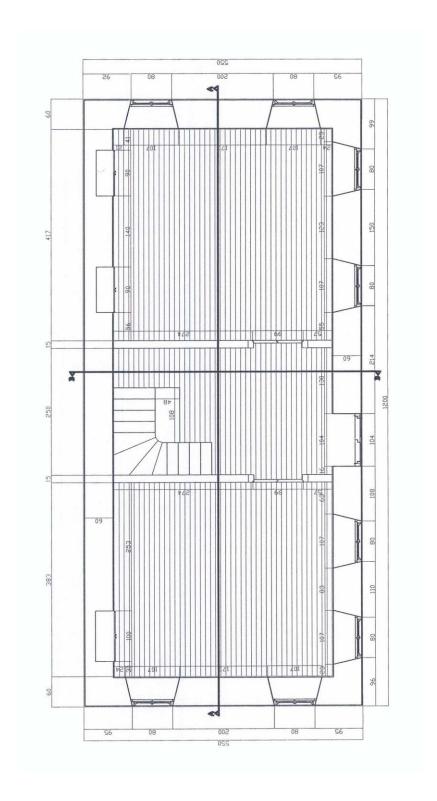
First Floor Plan of 39-Türkkuyusu Street Scale: 1/75
